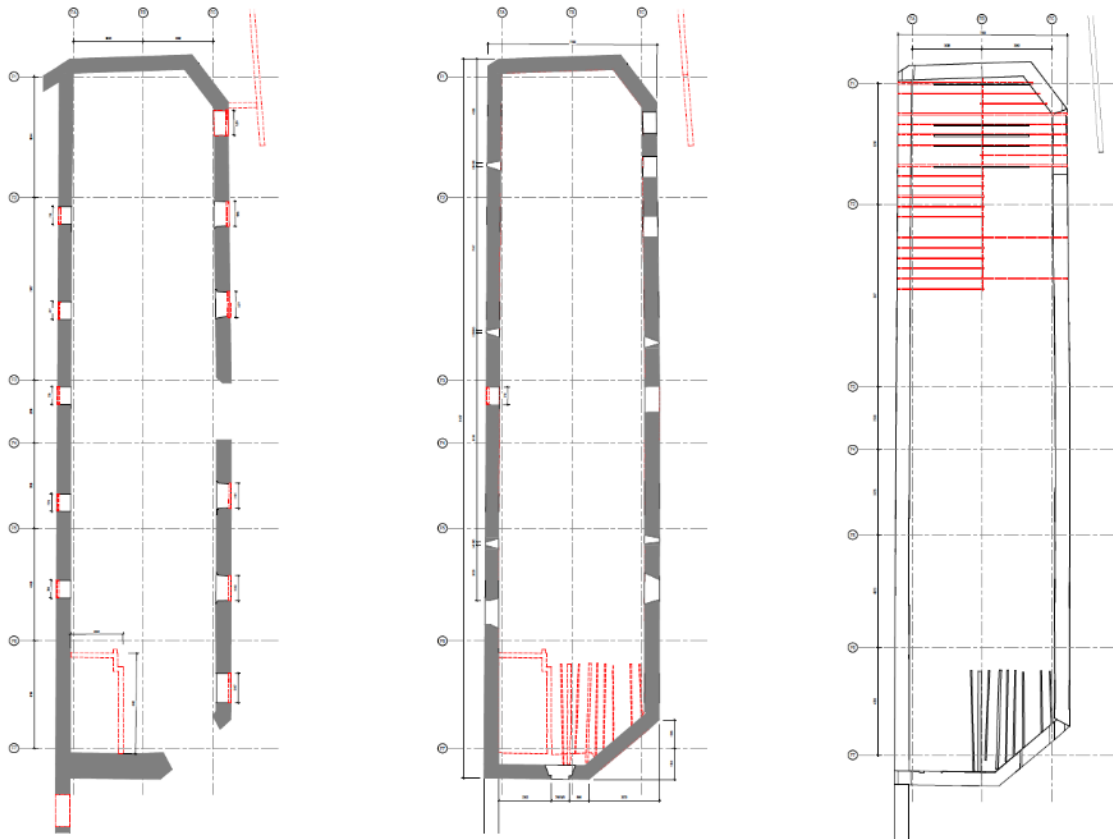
Barn, demolition plans. Source: TOT Architects, from left to right: ground floor, first floor and roof plans. Red lines indicate built fabric for removal.
